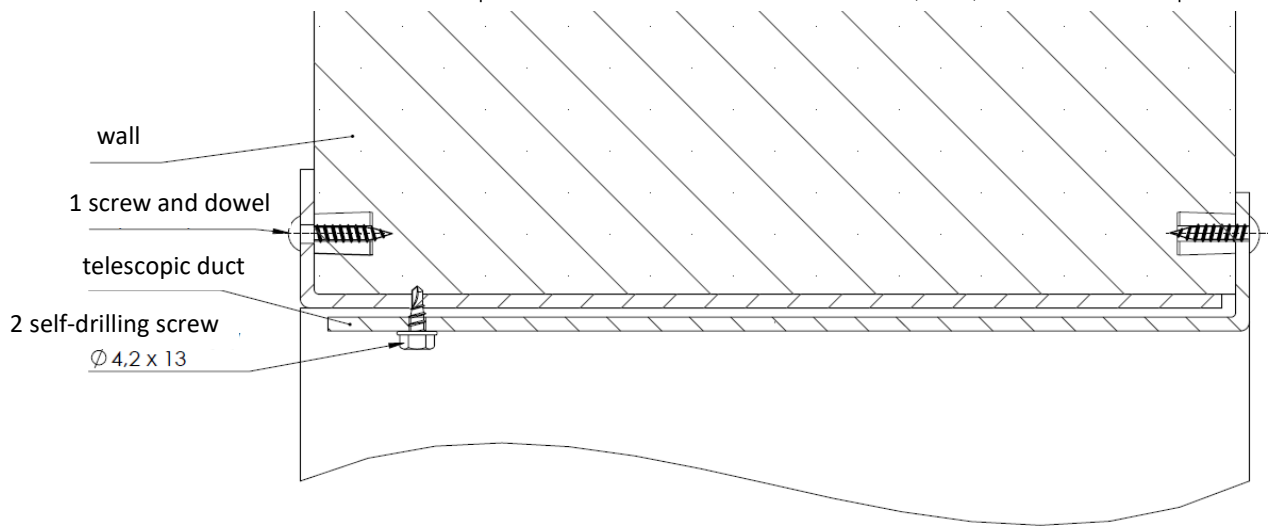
Installation of a telescopic duct in a brickwork wall.
